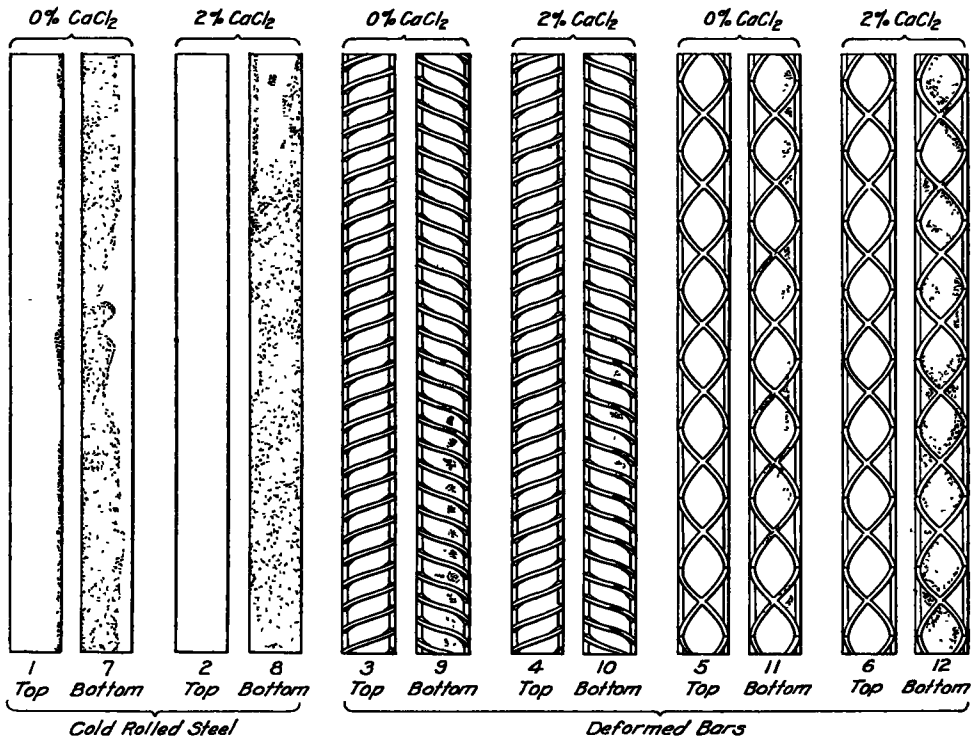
Upper and Lower Surfaces of Steel Bars Cast Near Bottom of Specimens of Group II
